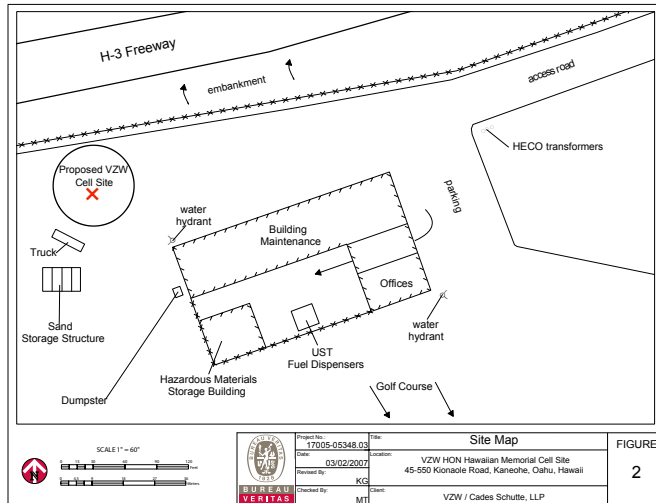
Verizon Hawaiian Memorial proposed cellular site plan, courtesy of Bureau Veritas North America, Inc.
